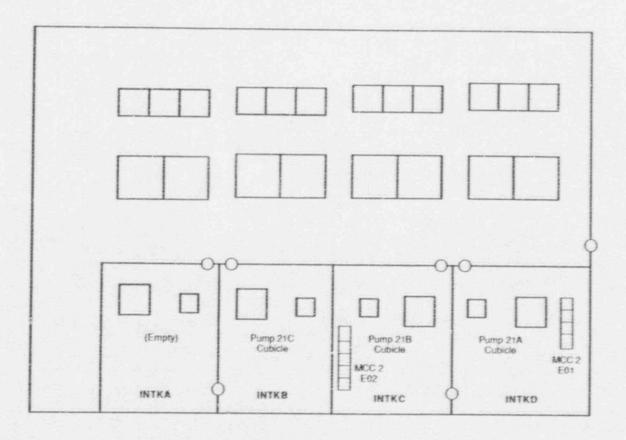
Beaver Valley 2 Intake Structure Elevation 705'
